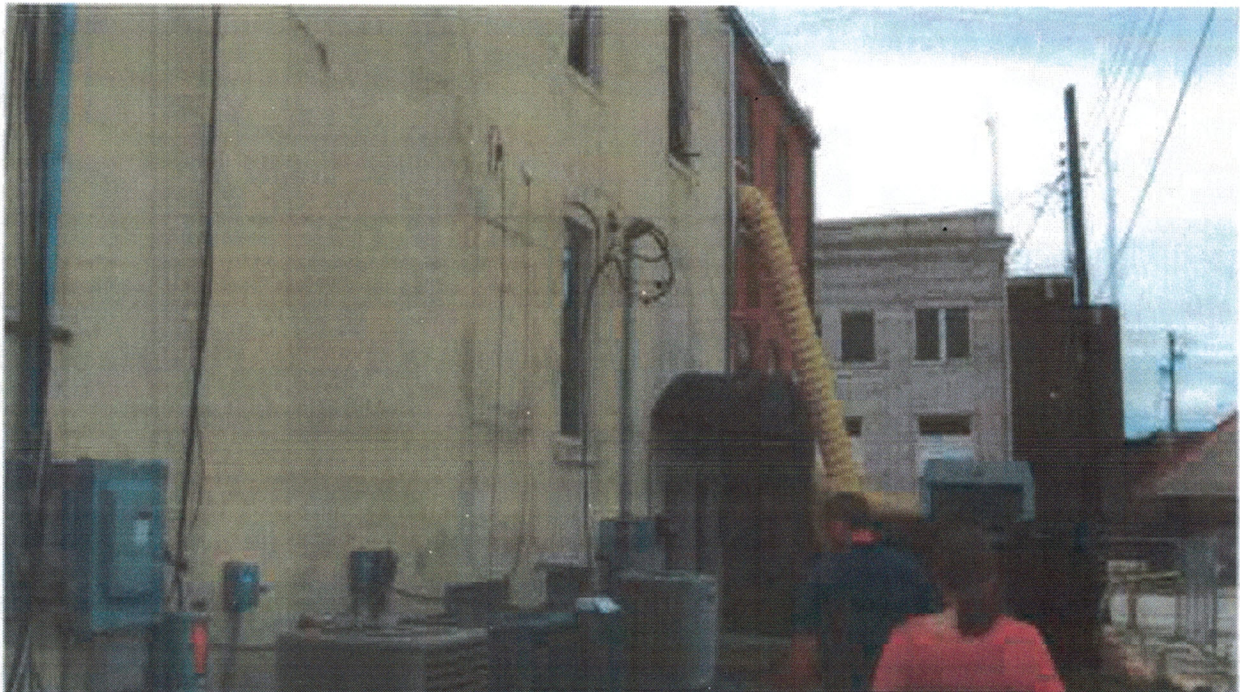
West exterior wall, cracks in stucco finish do not appear to be recent. AC condensers appear salvageable.
